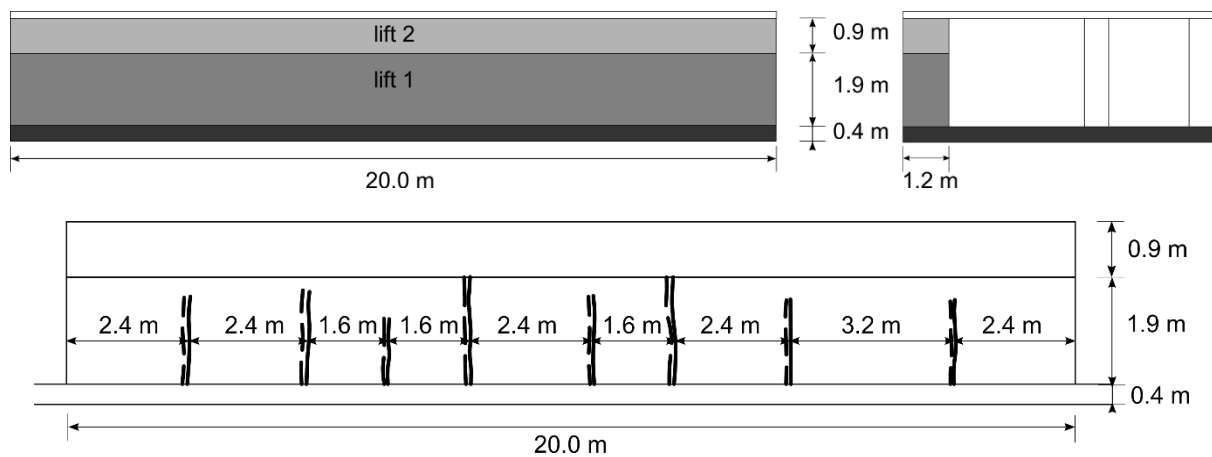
Civaux mock-up wall: longitudinal view; cross-section; cracking pattern (crack widths 1×0.04 mm, 4×0.1 mm, 2×0.2 mm and 1×0.5 mm).
